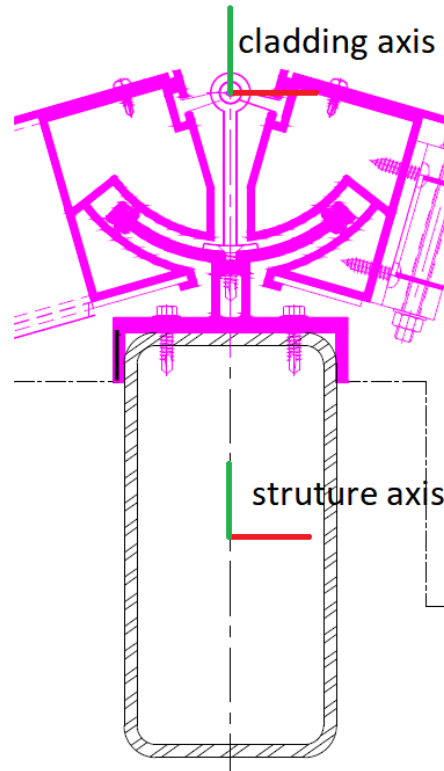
aluminium cladding joint detail and location of structural and cladding axis
